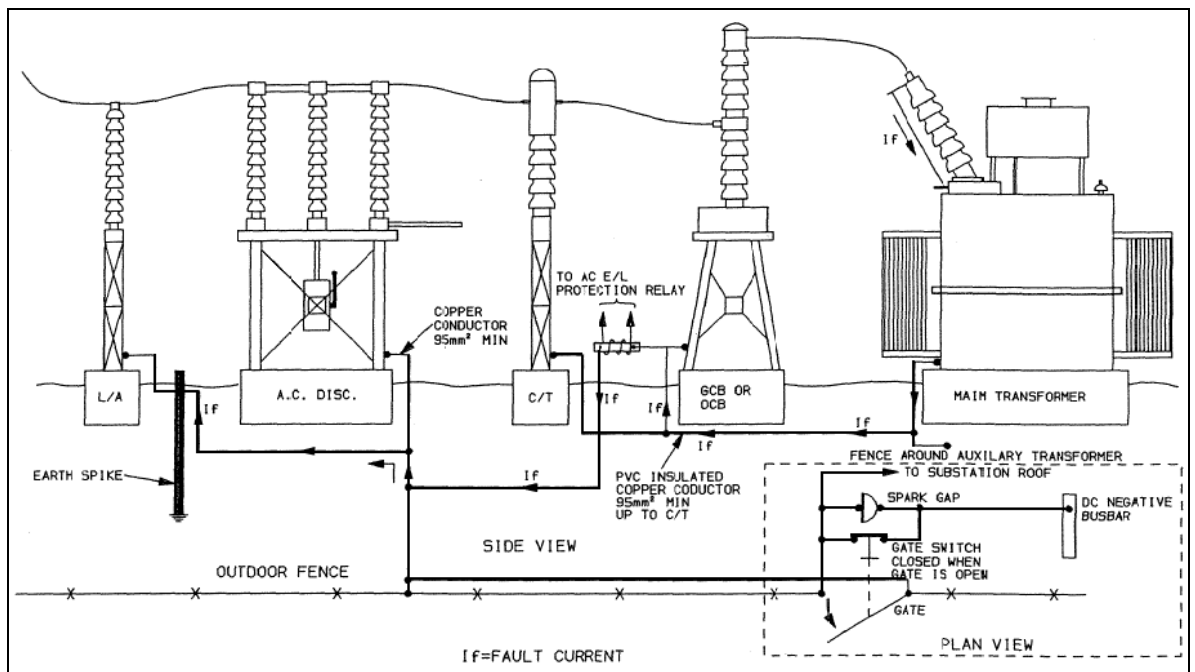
Typical layout of the earthing of the equipment in the outdoor yard
